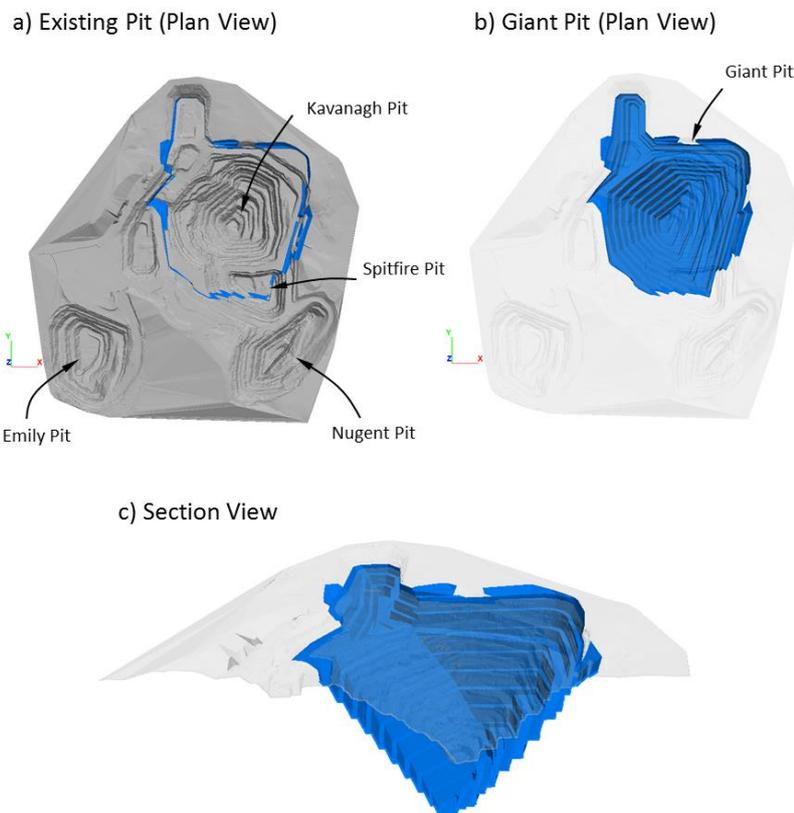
Existing Kavanagh Pit and proposed Giant Pit design
